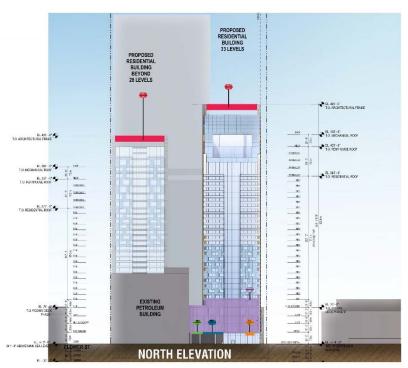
Alternative A Sign Dimensions and Locations - North Elevation
